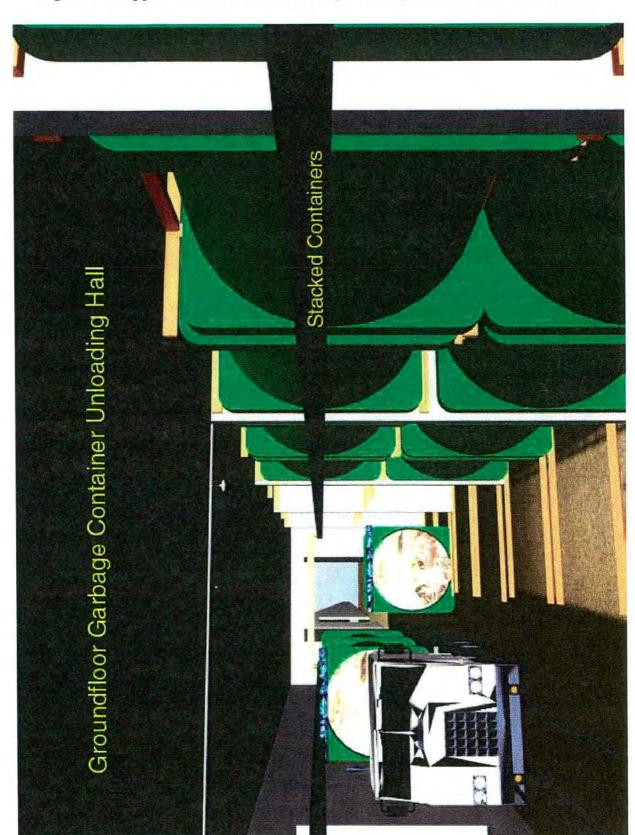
Upper-Basement WTE Building - Garbage Container Unloading Hall
